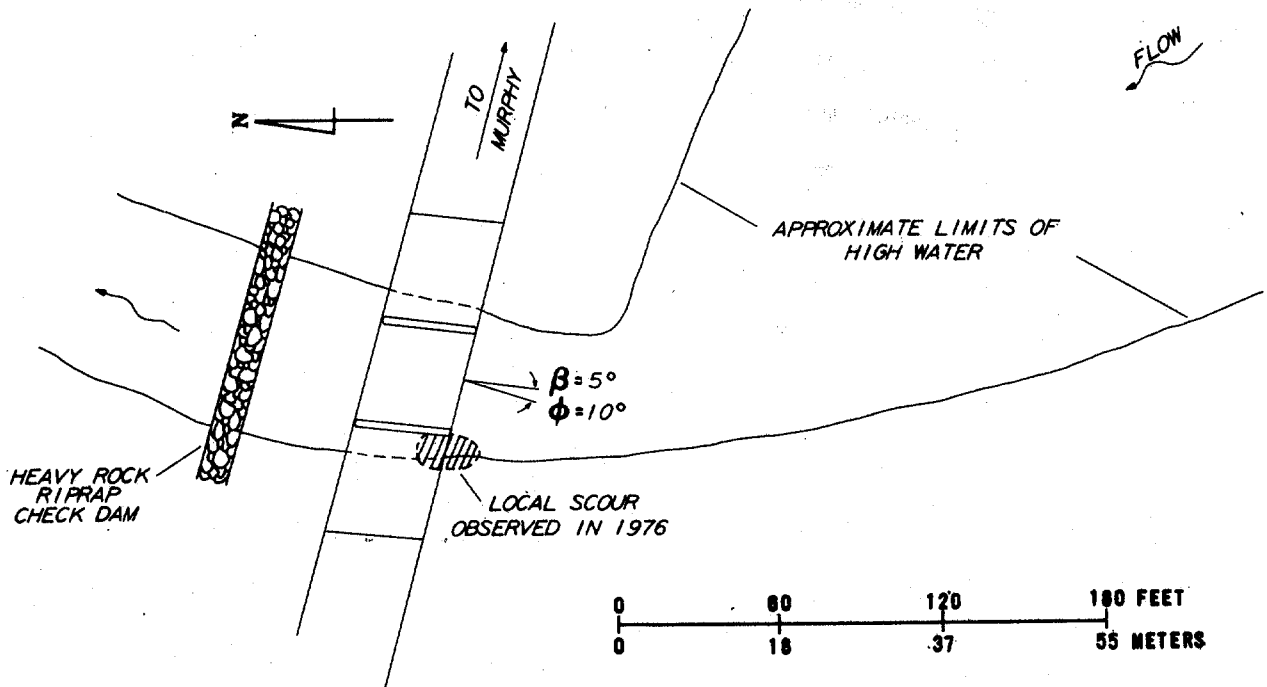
Plan of SR-45 crossing at Murphy, Idaho.
